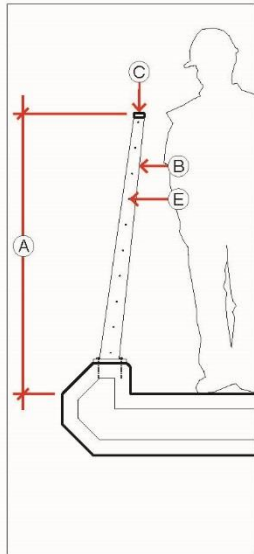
Pedestrian railing type 1 typical section
